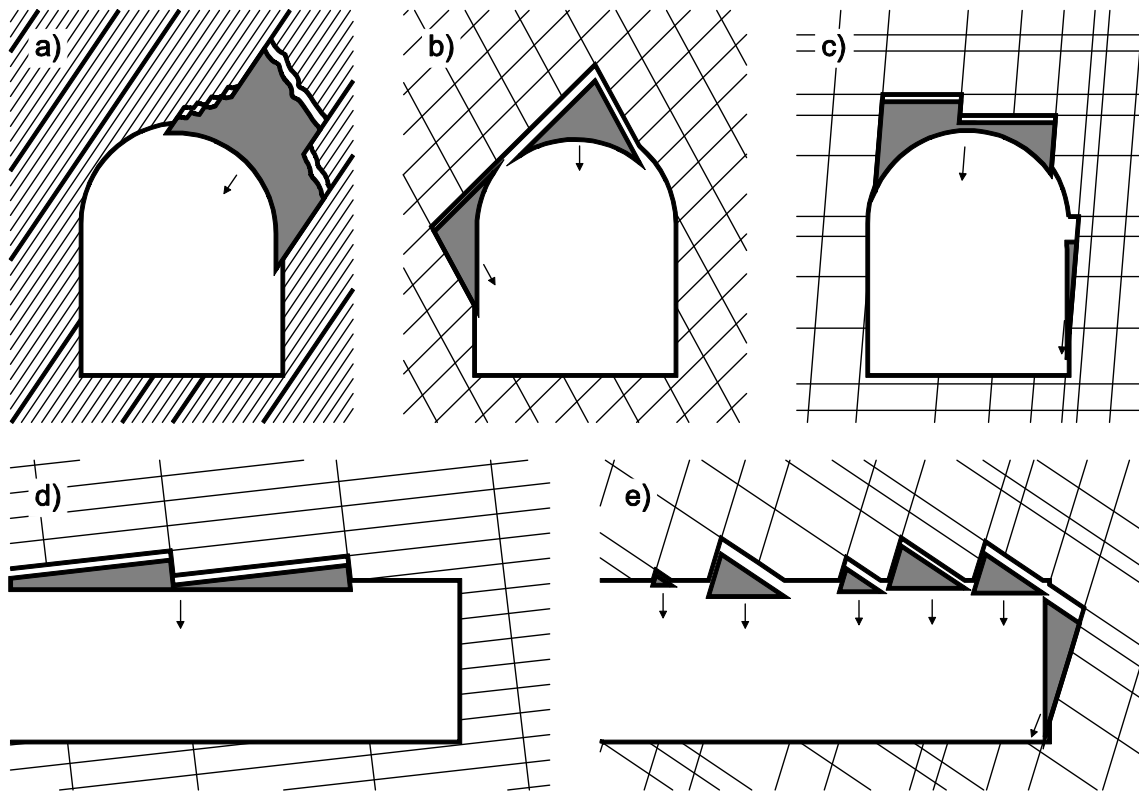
Exemplary influence of the joint network geometry on underground excavations and the resulting excavation profile after discontinuity-controlled block failure; a) discontinuity controlled block failure along shear zones in foliated rock masses with tensile failure, b) and c) wedge (block) detachment in the roof and side walls, d) “Sargdeckelbildung” in the roof section with a saw-tooth profile (cross section), e) wedge detachments in the roof and tunnel face (cross section).
